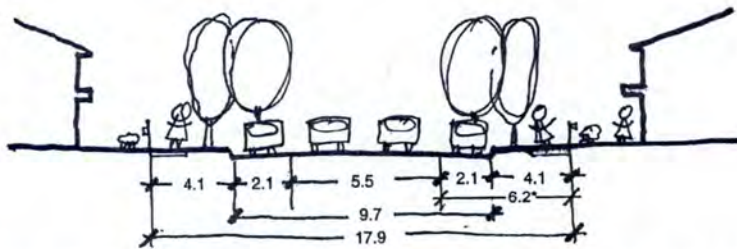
ACCESS STREET B - WIDER ACCESS STREET 40 km/hr (<3000 vpd)
